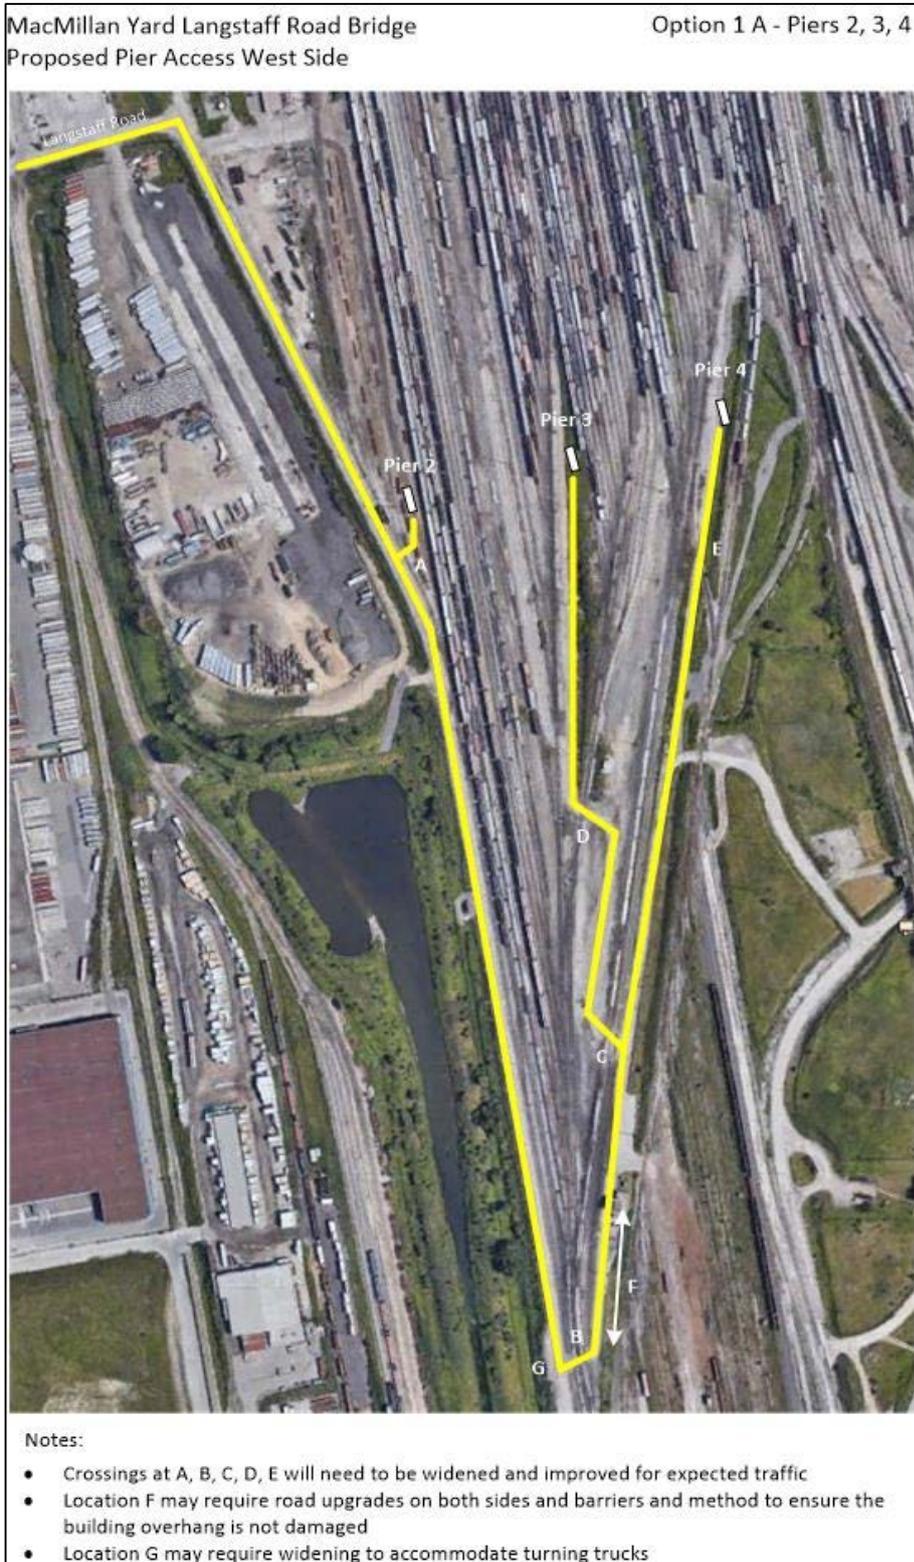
Proposed Pier Access – Pier #2, #3 and #4
